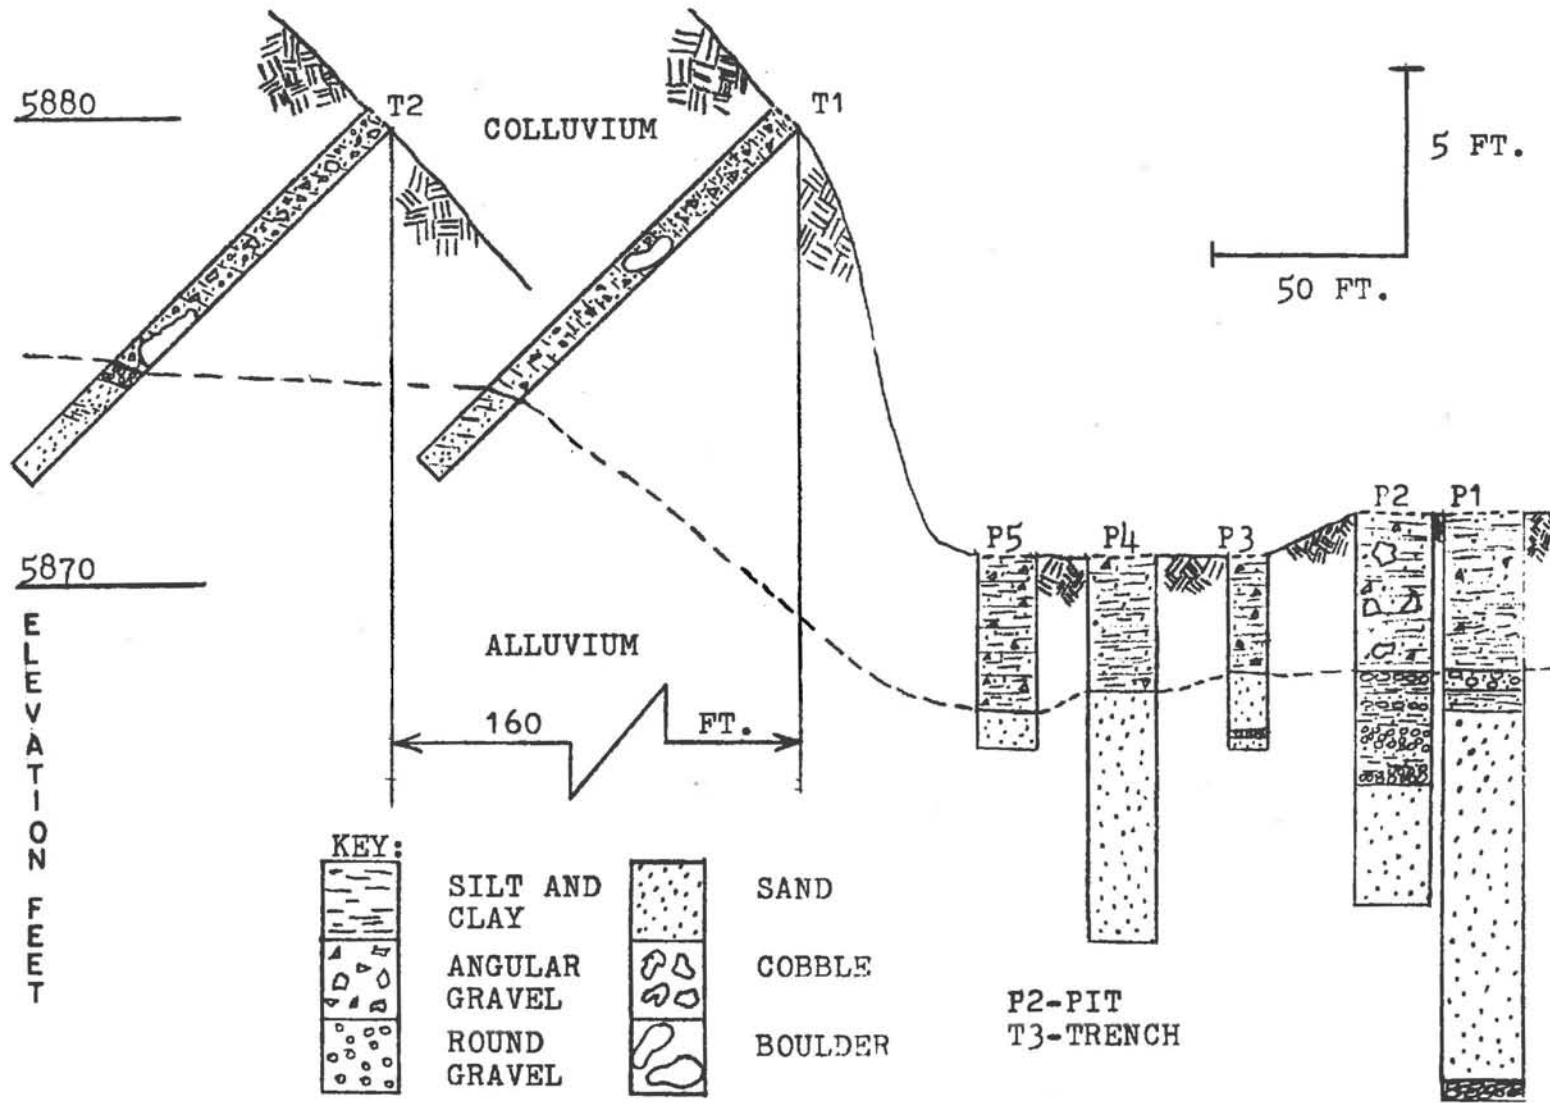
DETAILS OF TEST SITE SUB-SURFACE.
